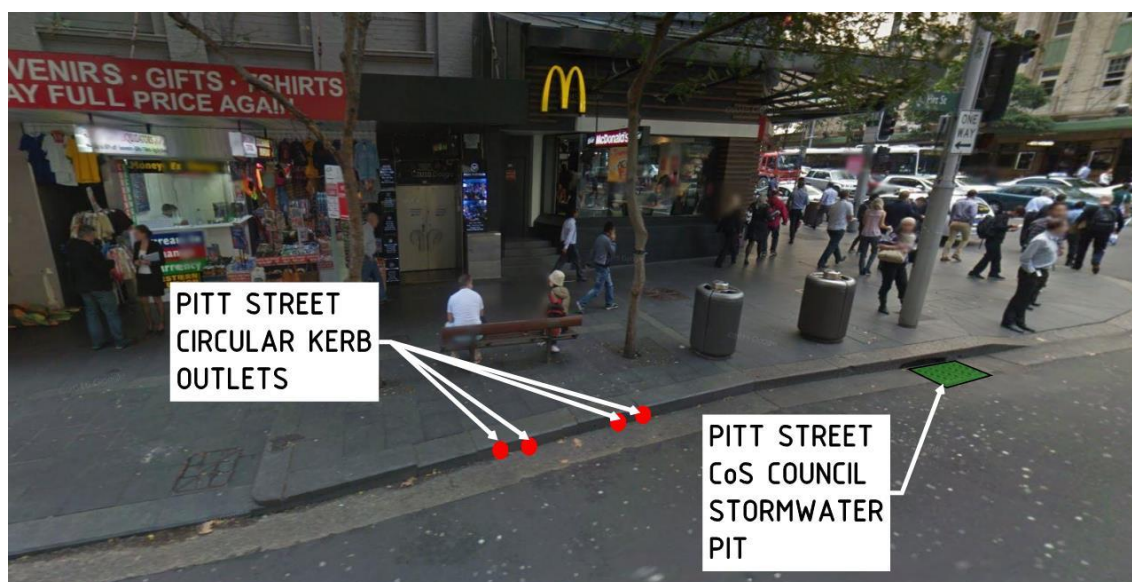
Existing Pitt Street Site Kerb Connections (Google Streetview)
